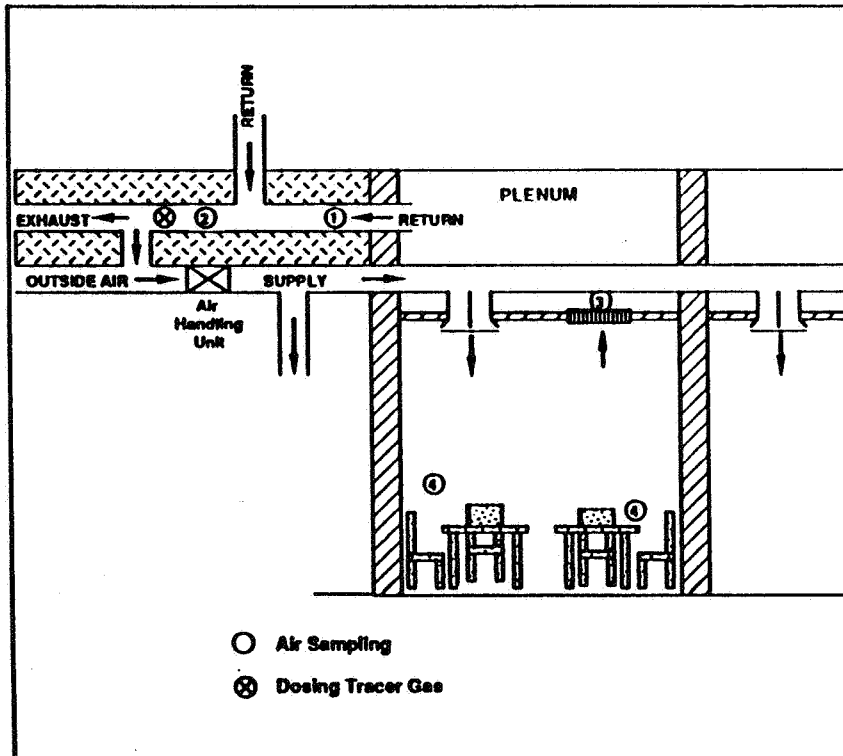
Schematic of a section of a building, showing location of dosing and sampling points in a typical measurement. Sample locations: 1: zone return; 2: section return; 3: grille; 4: breathing level.
